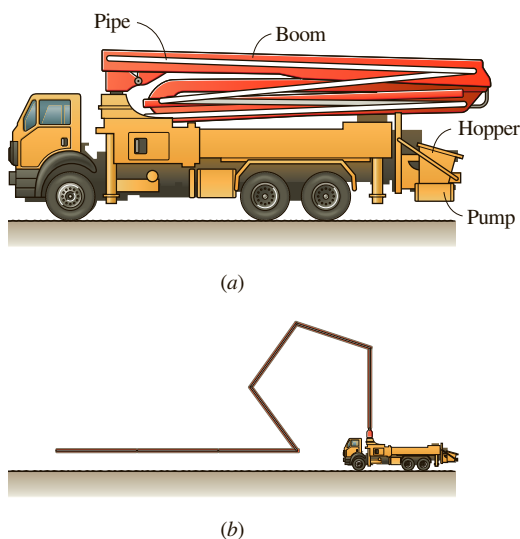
Concrete pump trucks have not changed much since the 1960s
